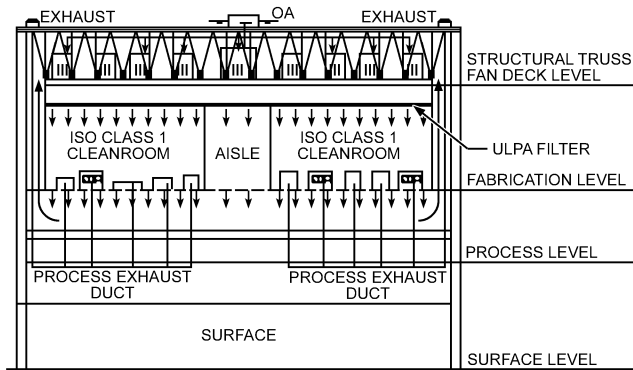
Building Truss Level Arranged as Fan Deck and Air Plenum
